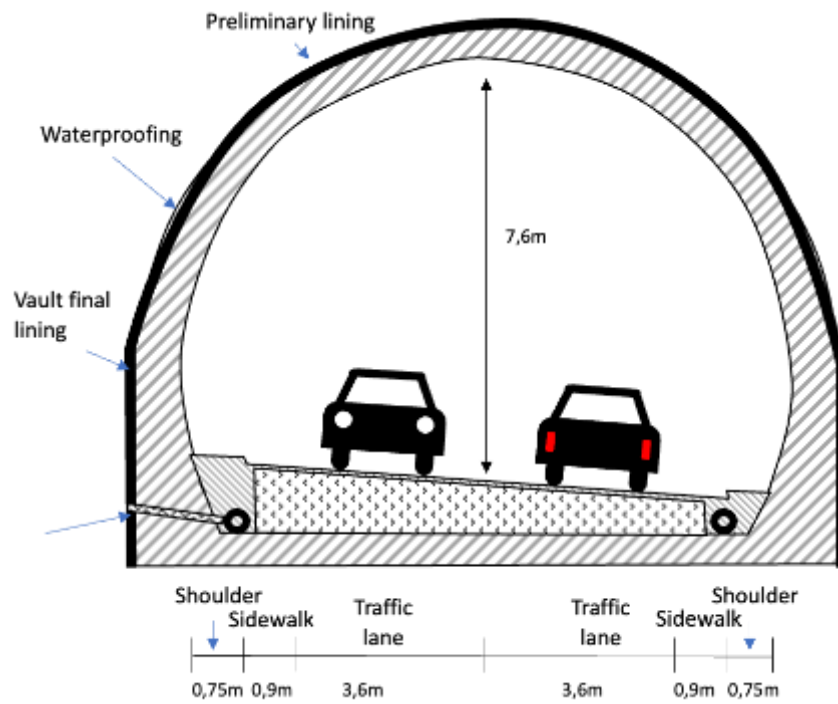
Schematic Typical Cross-section of the Other Tunnels
